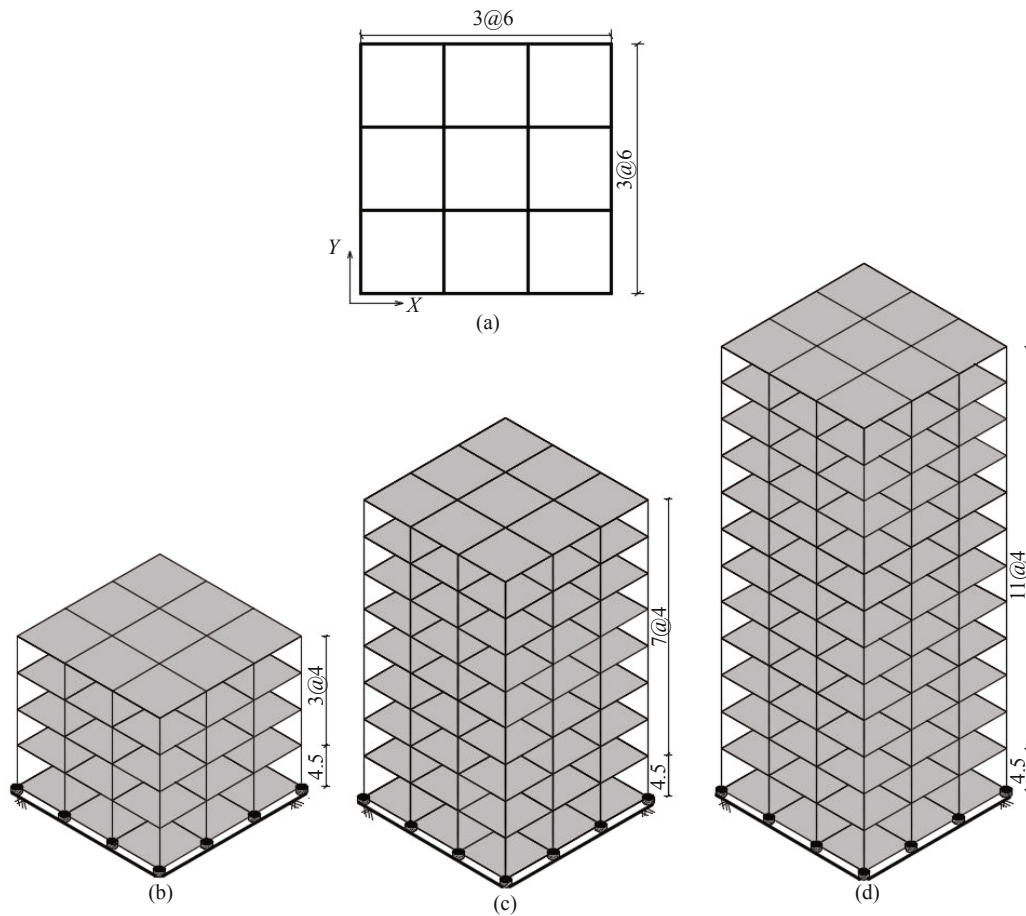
Building configuration (all dimensions in m): (a) typical plan; (b) 4-story; (c) 8-story; (d) 12-story base-isolated buildings
